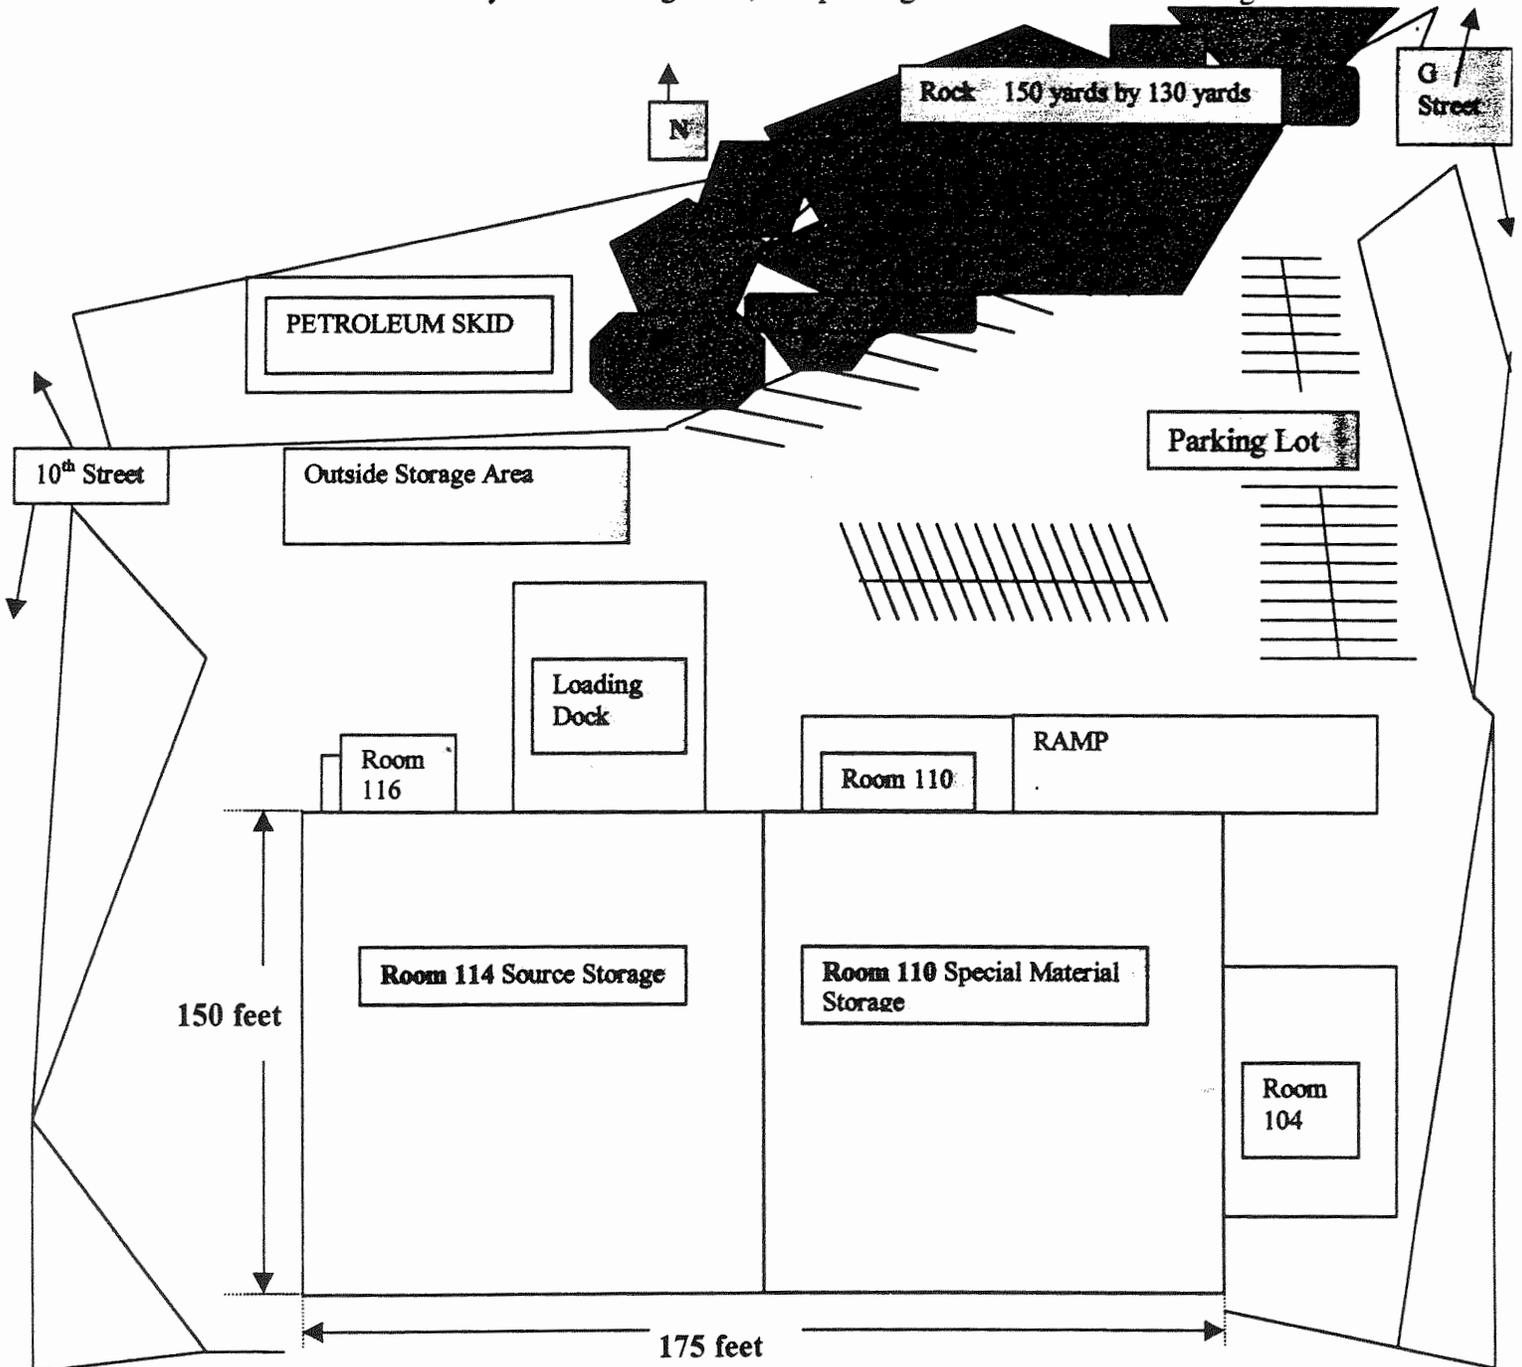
LAYOUT OF PRE-EXISTING BUILDING 4064
